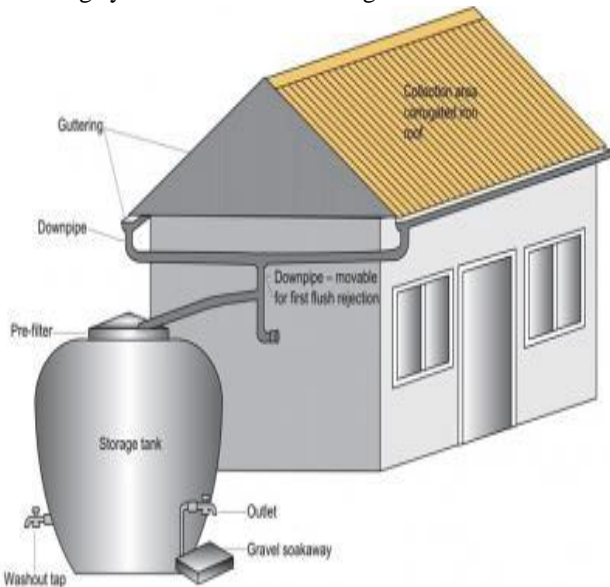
Rainwater Harvesting System with Roof Catchment Connecting Pipes and Storage Tank [8].
